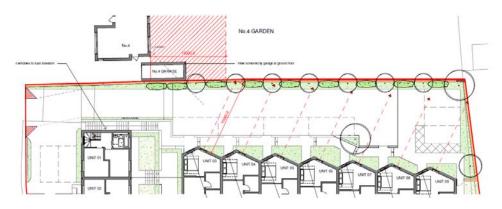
Plan showing protected area of neighbours garden (red hatching) and angled windows in proposal
